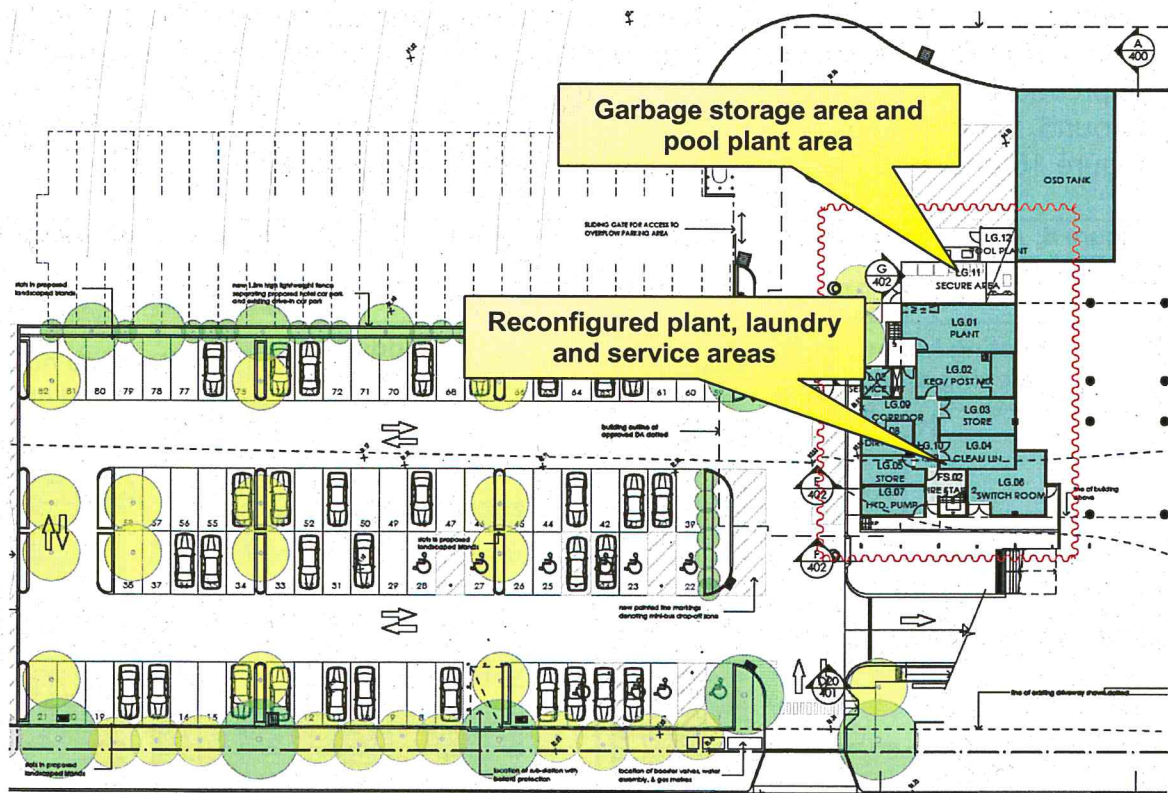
Proposed MOD 2 Lower Ground Floor Layout
